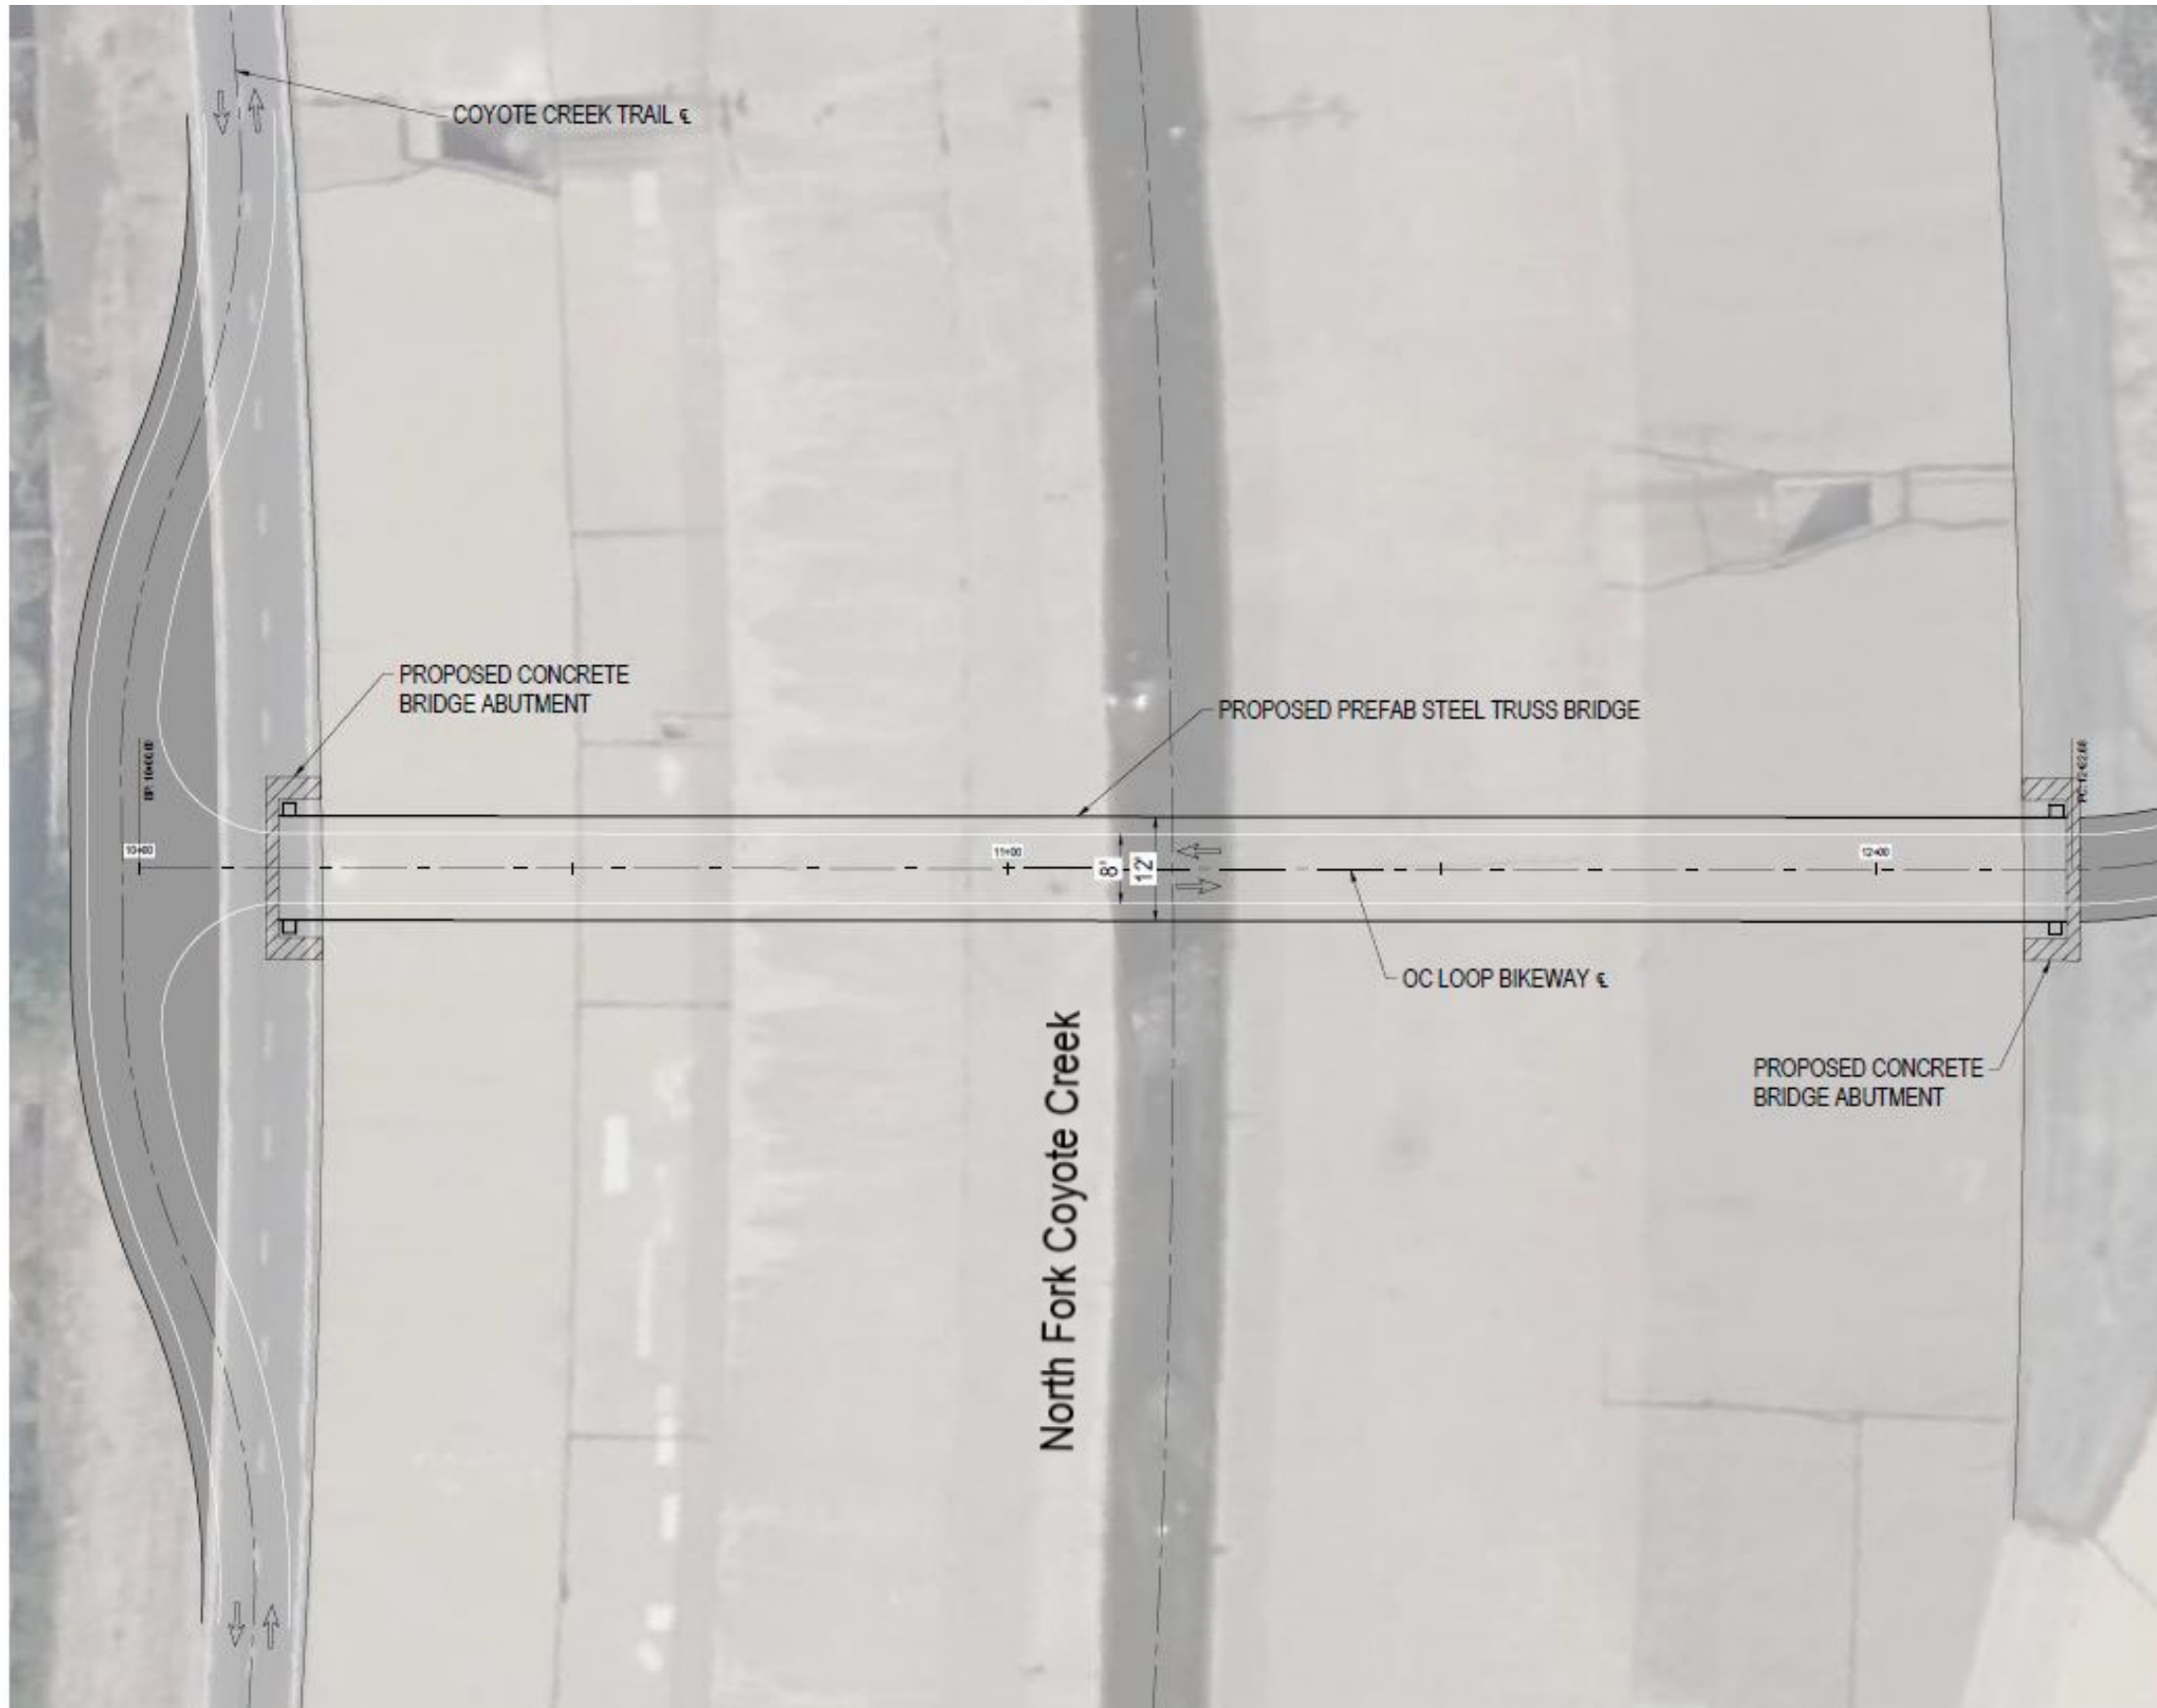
Bridge Location Map – Bridge #1: Coyote Creek 1 Bikeway Bridge
